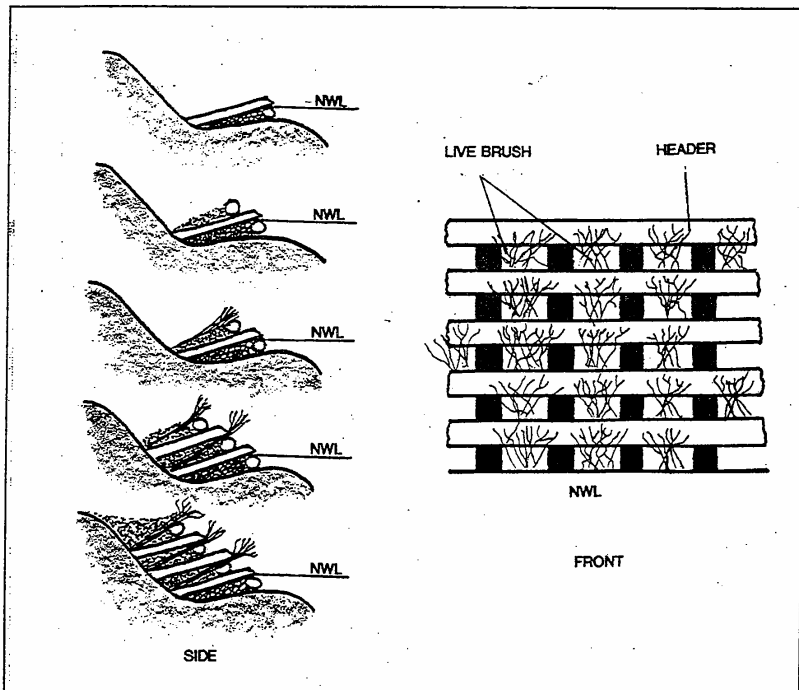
Construction of a live cribwall (Source: CBBEL Files)
